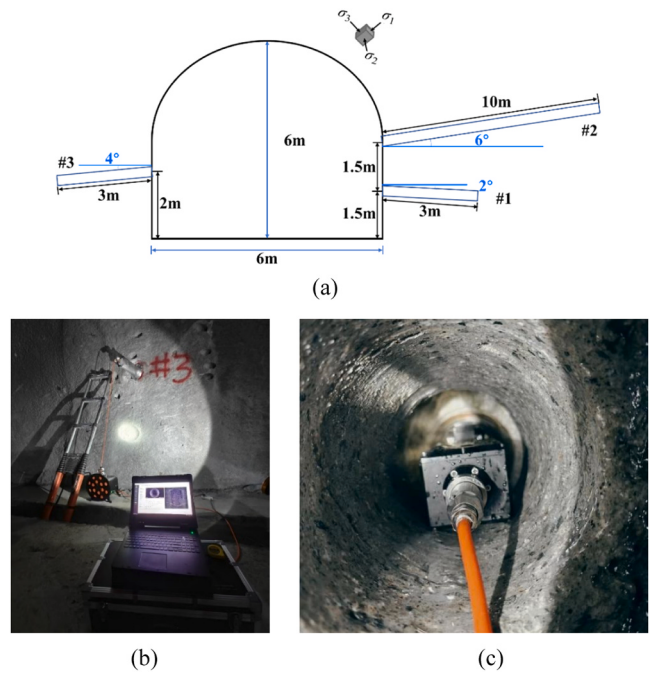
The on-site boreholes and equipment layout: (a) the arrangement of monitoring boreholes on site; (b) the on-site borehole layout; (c) the equipment is working in the borehole.
